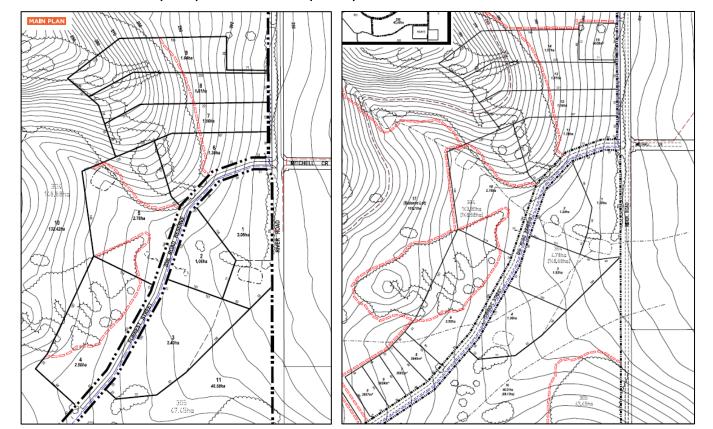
ORIGINAL (LEFT) AND AMENDED (RIGHT) SUBDIVISION PLANS
